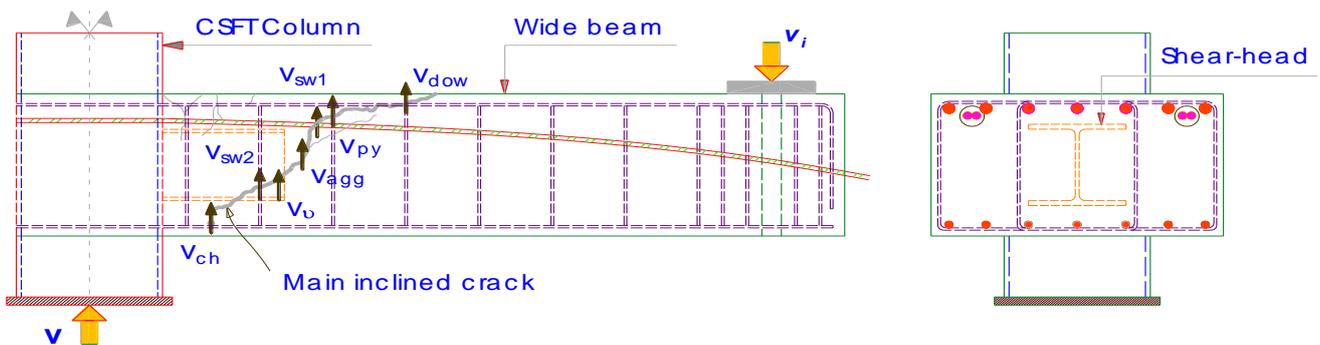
The mechanism of forces transfer on inclined cracks of wide beam
